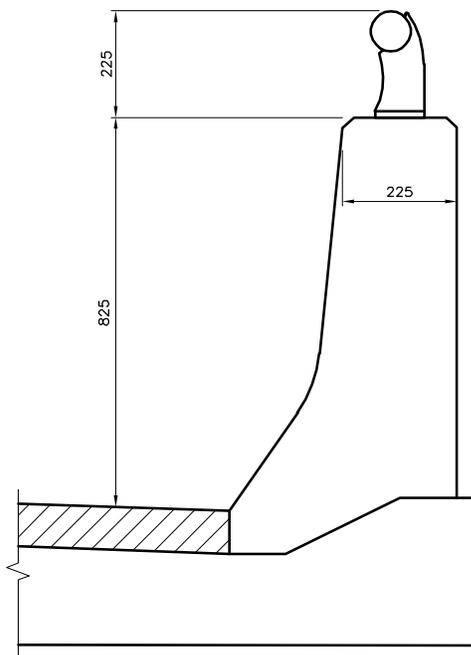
Barrier Wall with Railing (TL-4)
